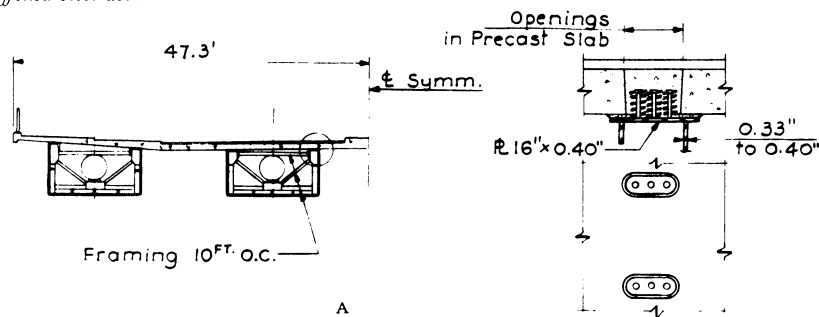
Emil Schulz Bridge, Berlin-Lichterfelde, Germany (1964). Span 157 ft. The boxes are jointed by three lateral frames at the quarter points and the centerline to form a grid. Stud shear connectors with small spirals connect the precast concrete deck slab to boxes
